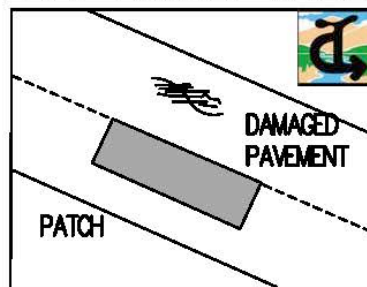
Example 11. Patch slope and grade must match existing pavement.
